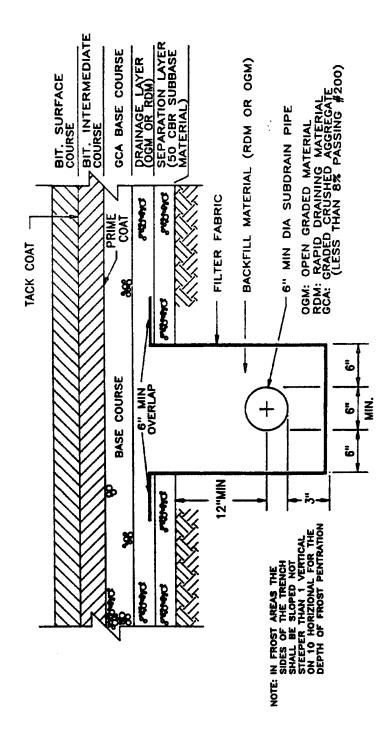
Typical Bituminous Pavement Interior Subdrain Detail
